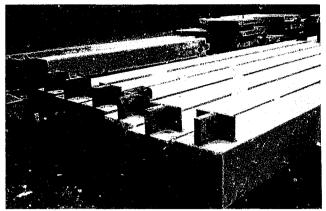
Column haunches consisting of embedded steel angles allow concealed connections as shown in Figs. 16 and 20d.
